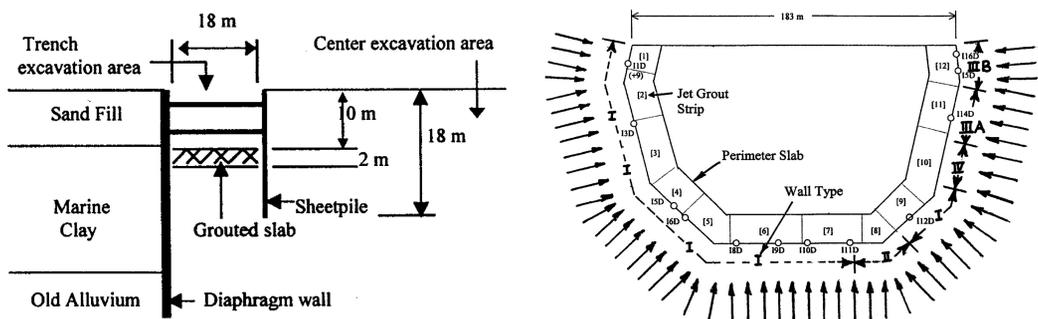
Perimeter concrete slab (16 m wide and 0.9 m thick) at formation level acting as a compression ring.
